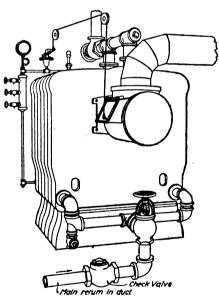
Typical Arrangement of Return, Showing Check Valve.
